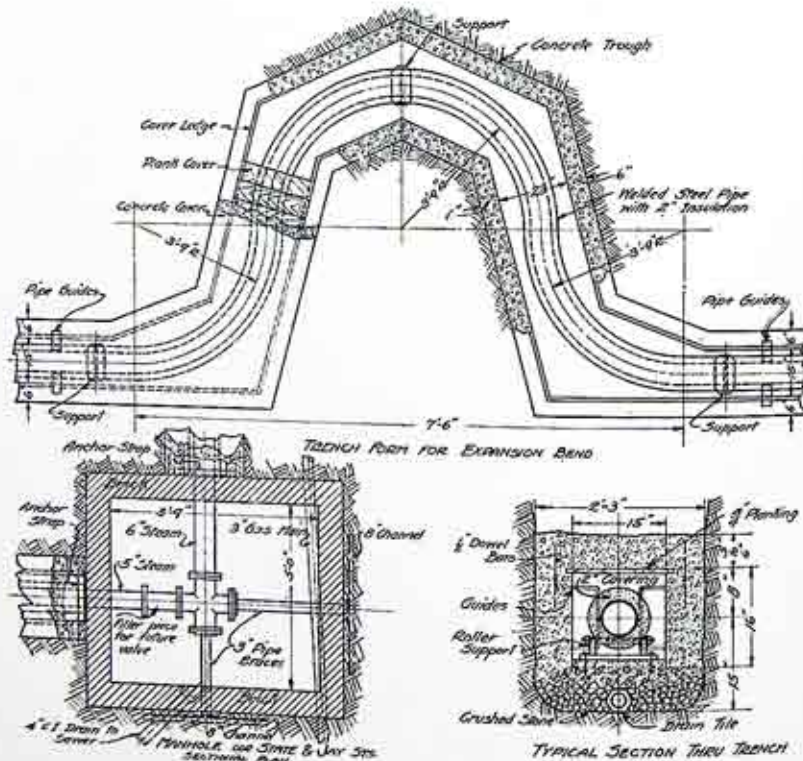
Illustration showing (1) General construction method used at the U-bends, (2) Cross section view of pipe line, and (3) layout of manhole at the corner of State and Jay Streets
